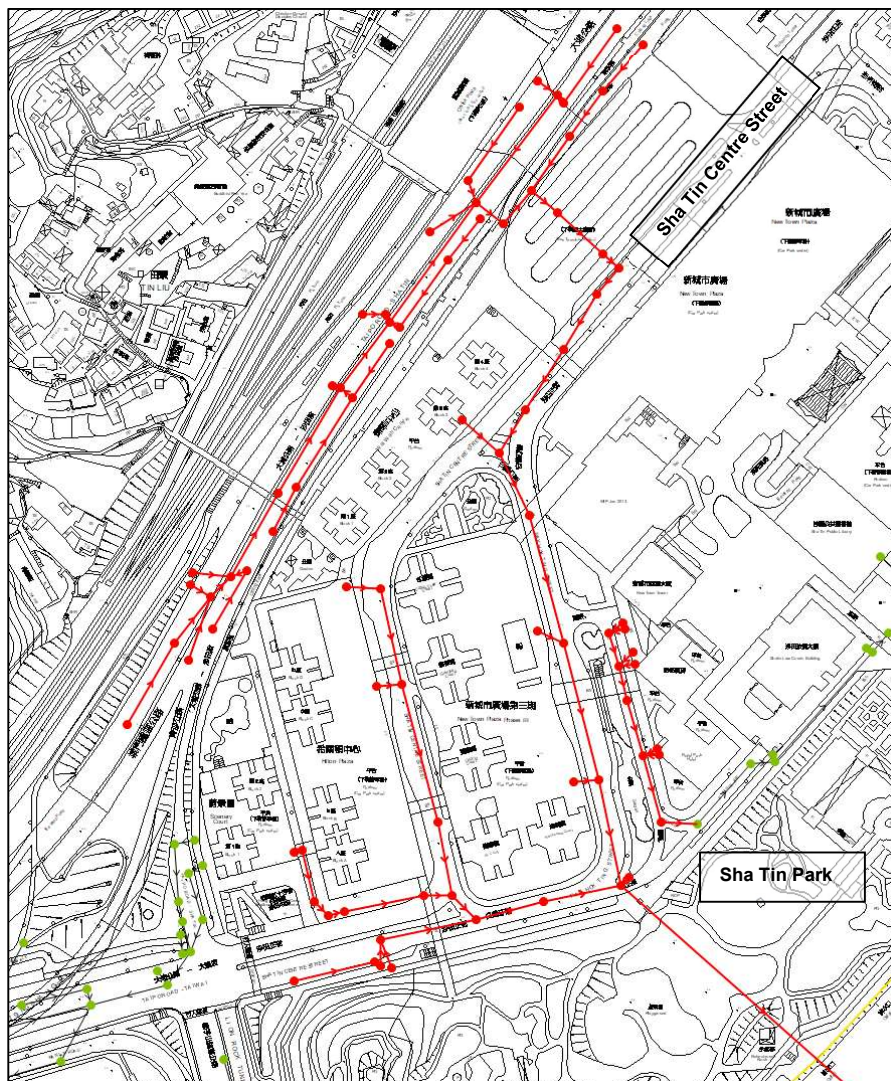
Existing Drainage Network at Sha Tin Town Centre
